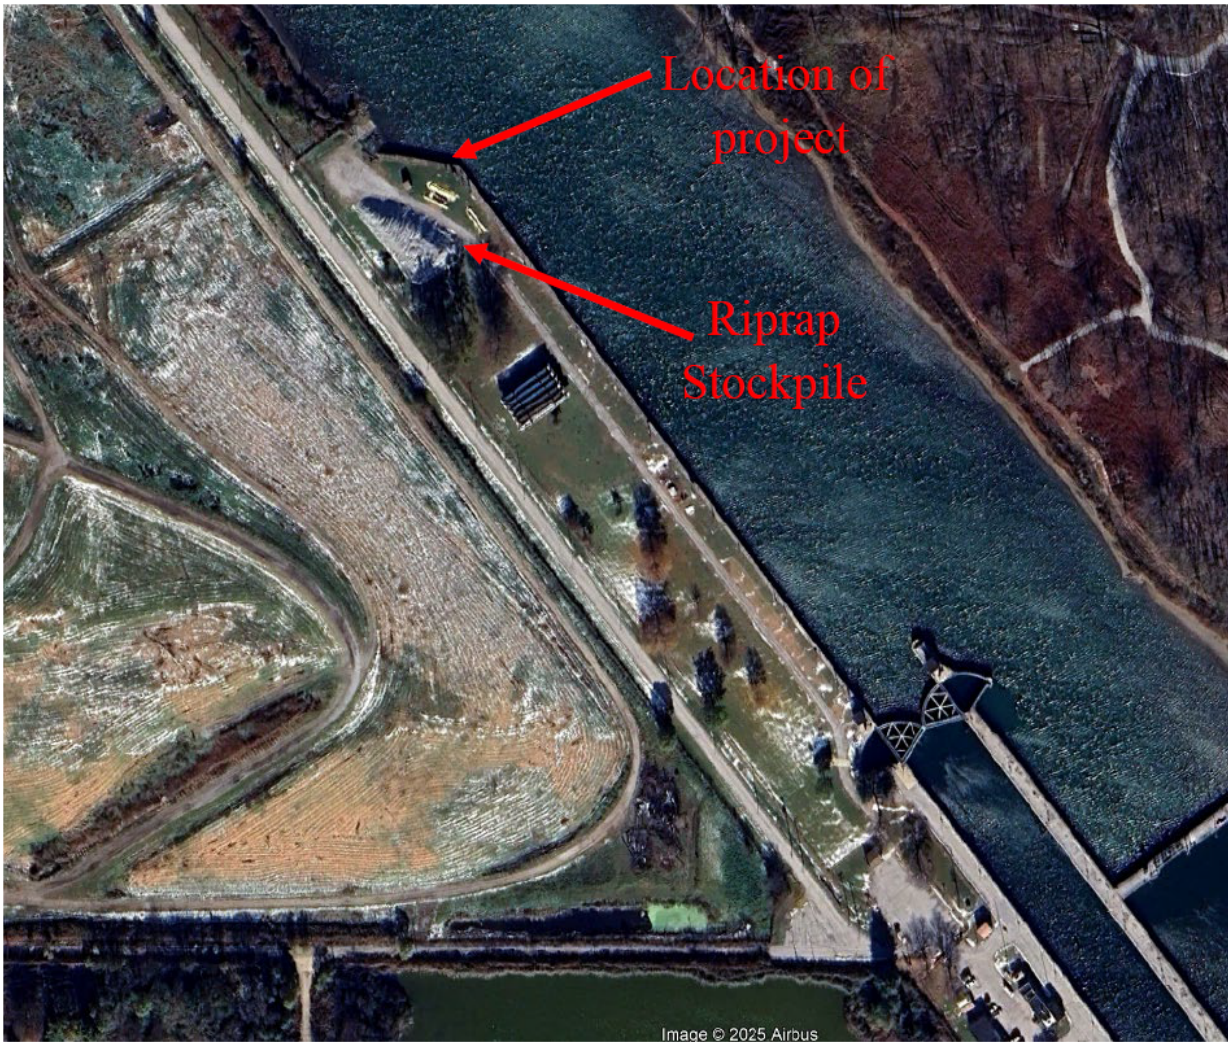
Locations of guide wall damage and stone stockpile.
